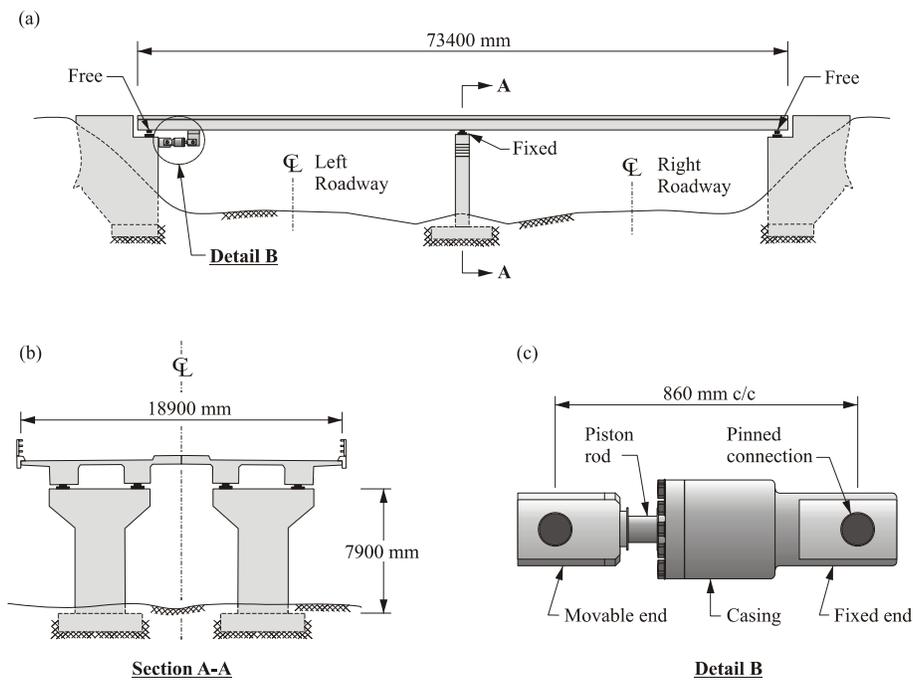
Bridge with viscous devices: (a) Elevation; (b) Column and deck; (c) SDU or STU.
